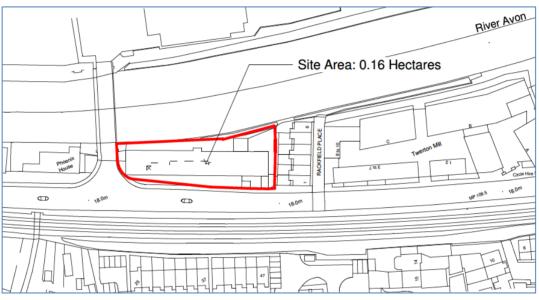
Extract from Site Location Plan – a full extract is shown at Appendix A.
